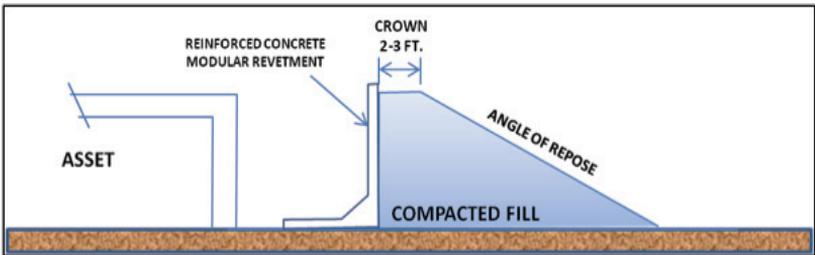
Soil Berm and Reinforced Concrete Revetment
